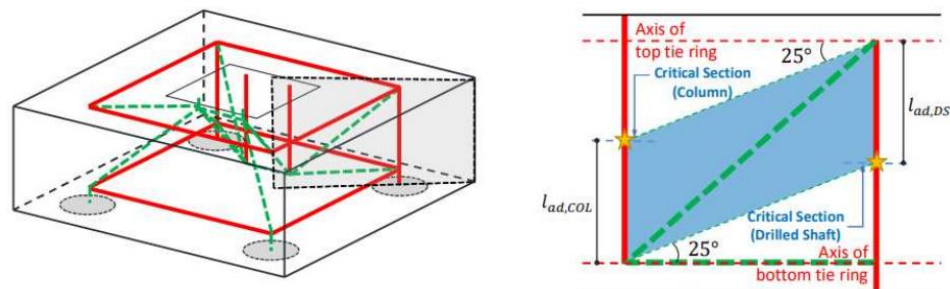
Compression field and critical section for drilled shaft reinforcement (Yousun et al. 2021)
